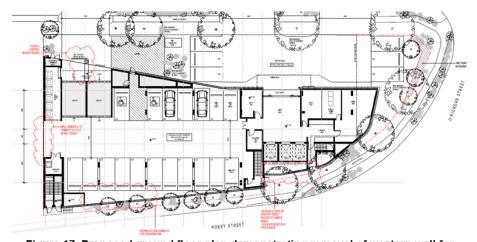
Proposed ground floor plan demonstrating removal of western wall for vehicular access to 10-12 Sarah Street
